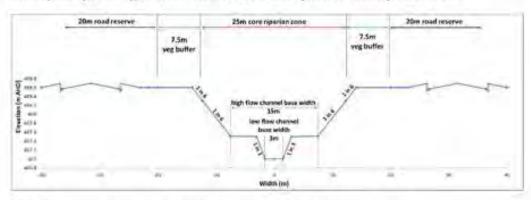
Conceptual arrangement of a typical cross section for a 40m wide waterway corridor
